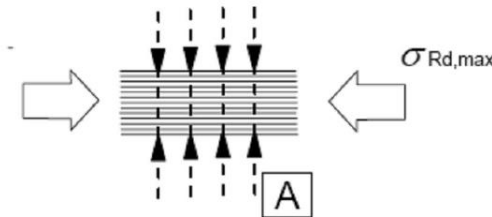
Design strength of concrete struts without transverse tension [5]
